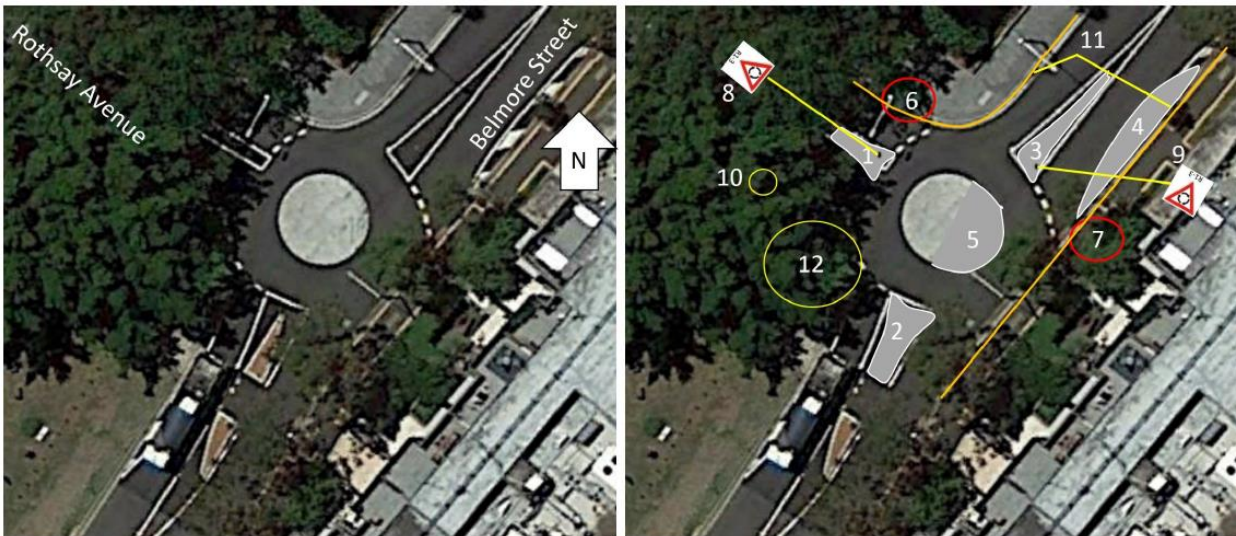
An aerial view of the existing intersection and proposed improvement concept
